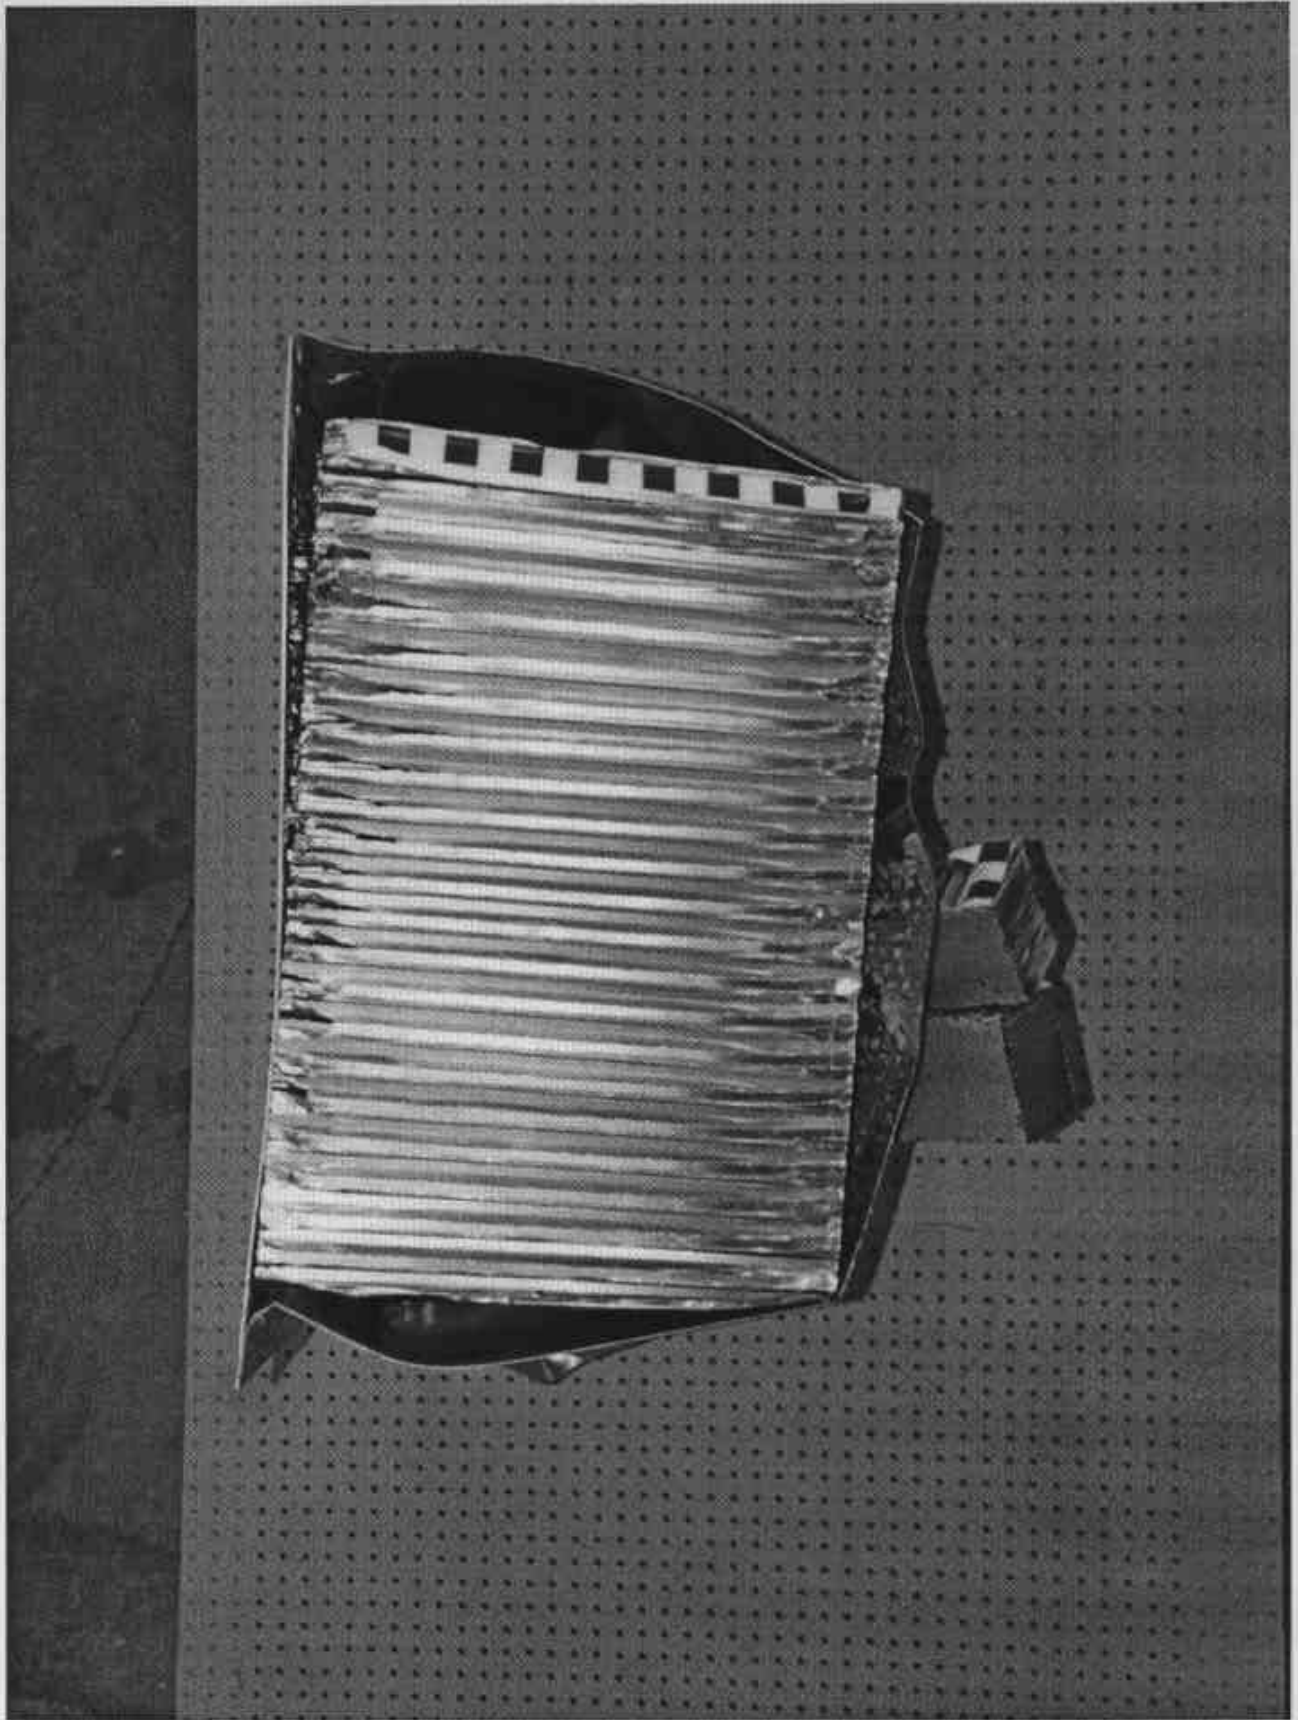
POST TEST BARRIER LEFT SIDE VIEW
